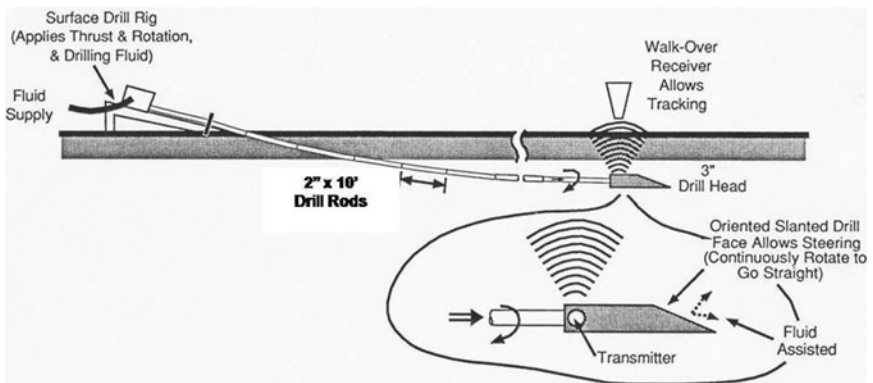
Mini-Horizontal Directional Drilling, Initial Pilot Boring Phase (Courtesy of Outside Plant Consulting Services).
